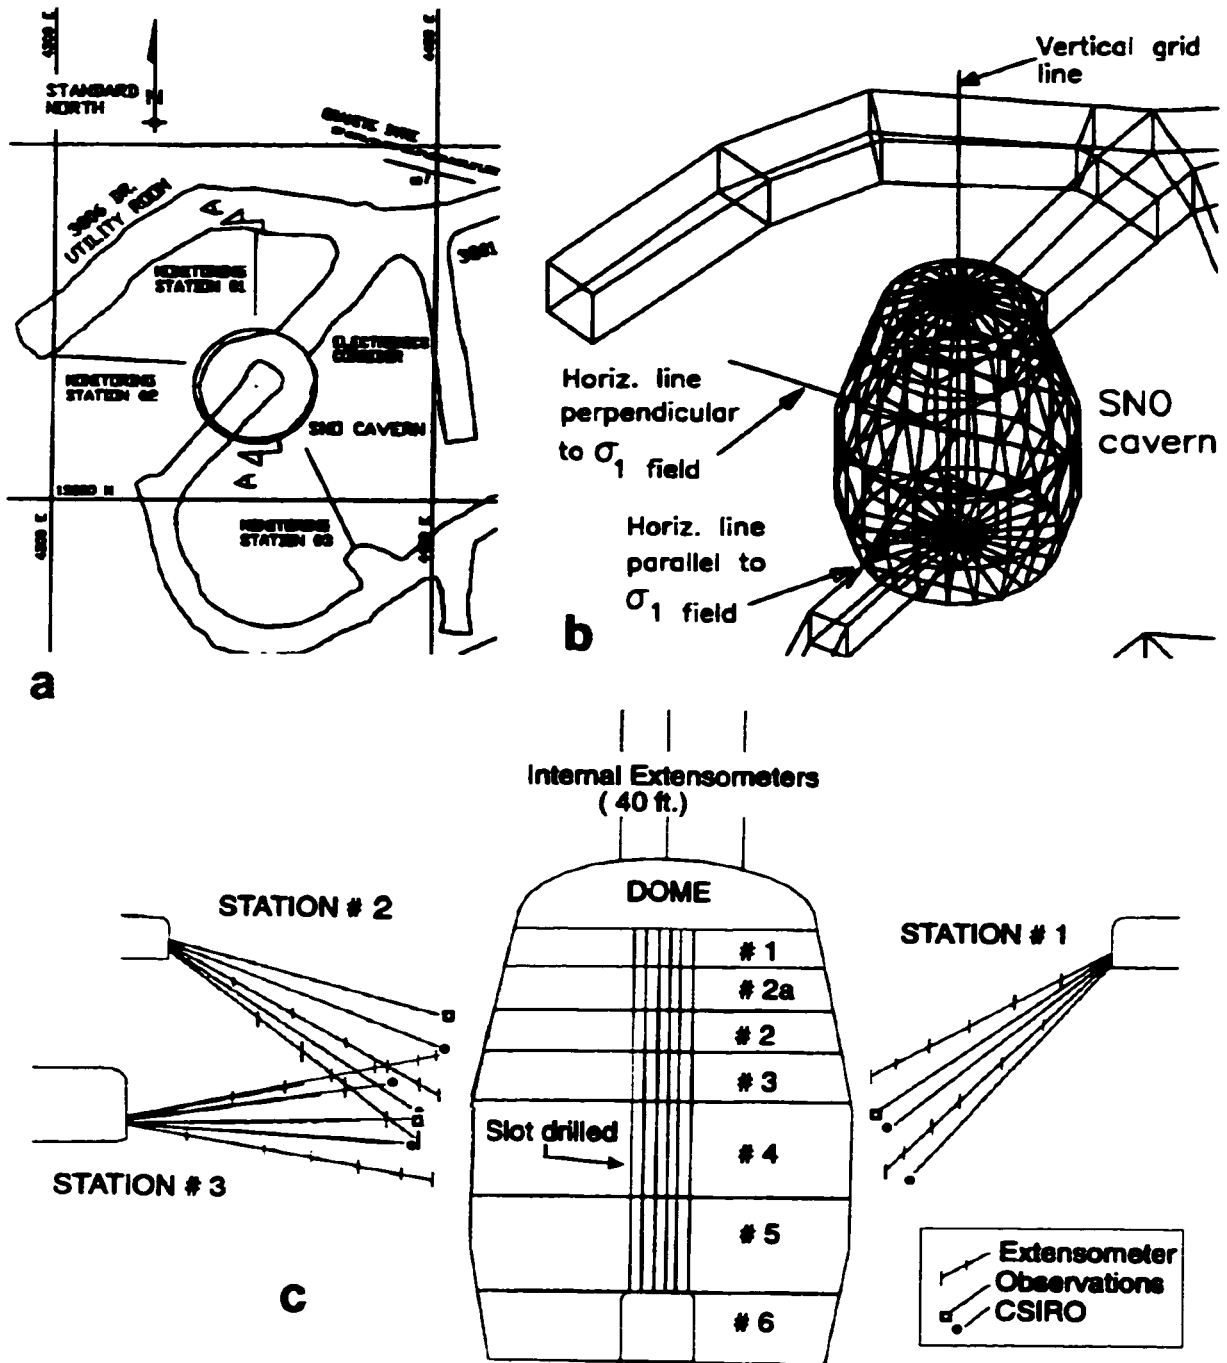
Sudbury Neutrino Observatory: a) plan view showing instrument stations; b) numerical model geometry for cavern; c) composite section through instrument stations - numbers indicate excavation stages (modified after Castro 1996).
